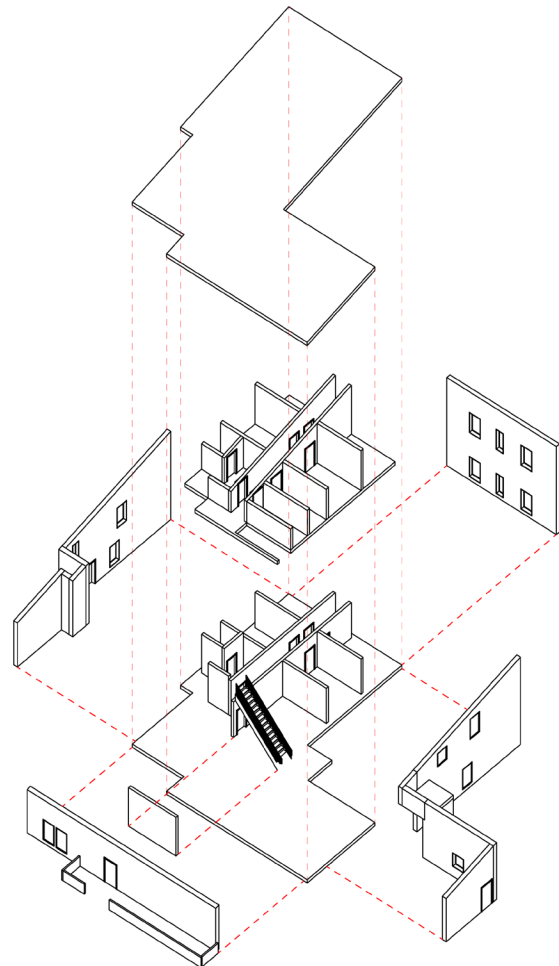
Floor plans of the “cottage” p145 building types
